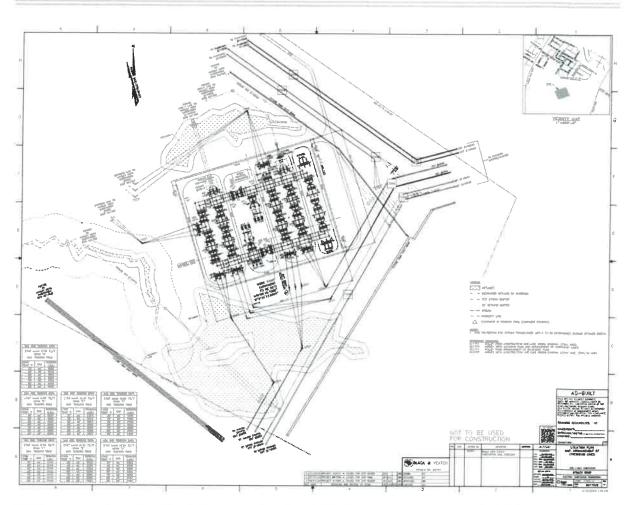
Location Plan Drawing of Solley Rd Substation (Drawing #621752E [01/10/2025])
